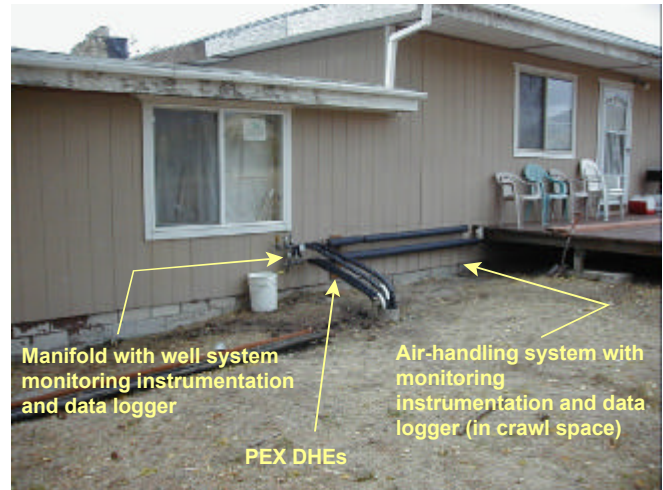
Final installation showing insulated piping and manifold prior to installing pipe enclosure.
